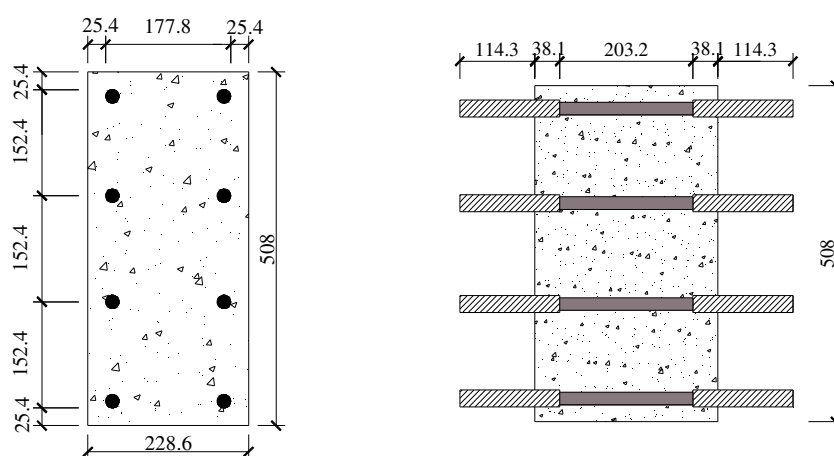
Dimensions of concrete block specimen (unit: mm).
